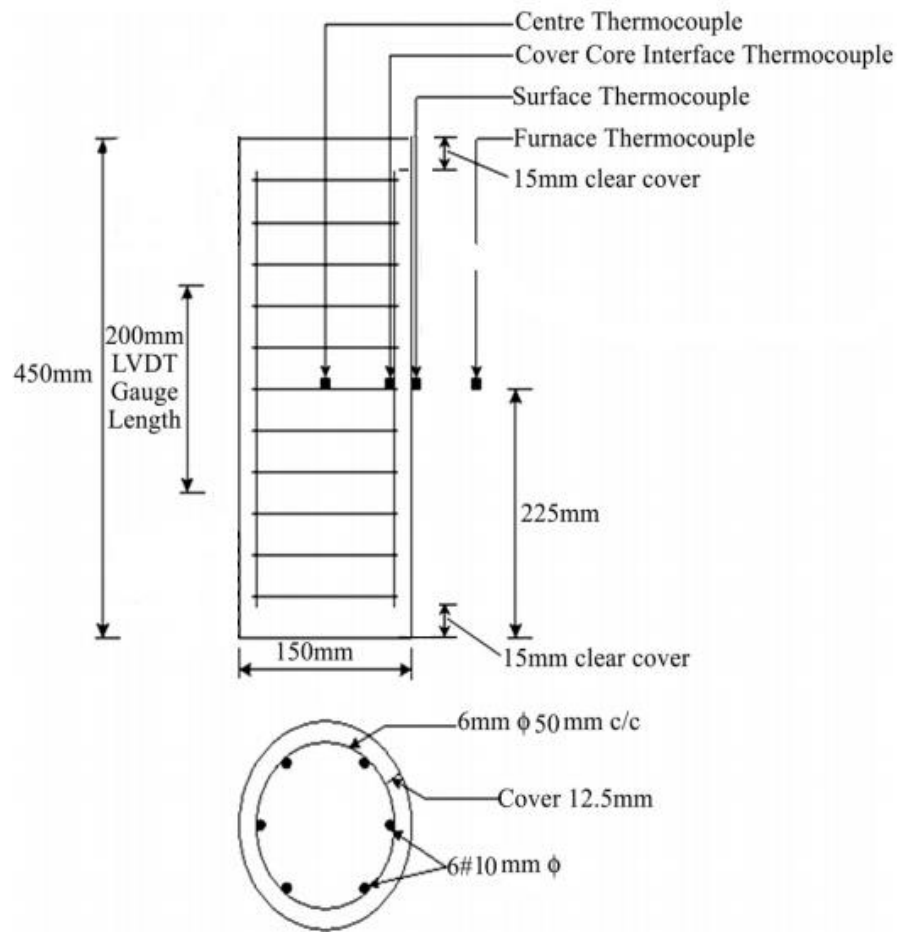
1: Size of specimens, reinforcement details and position of thermocouples
